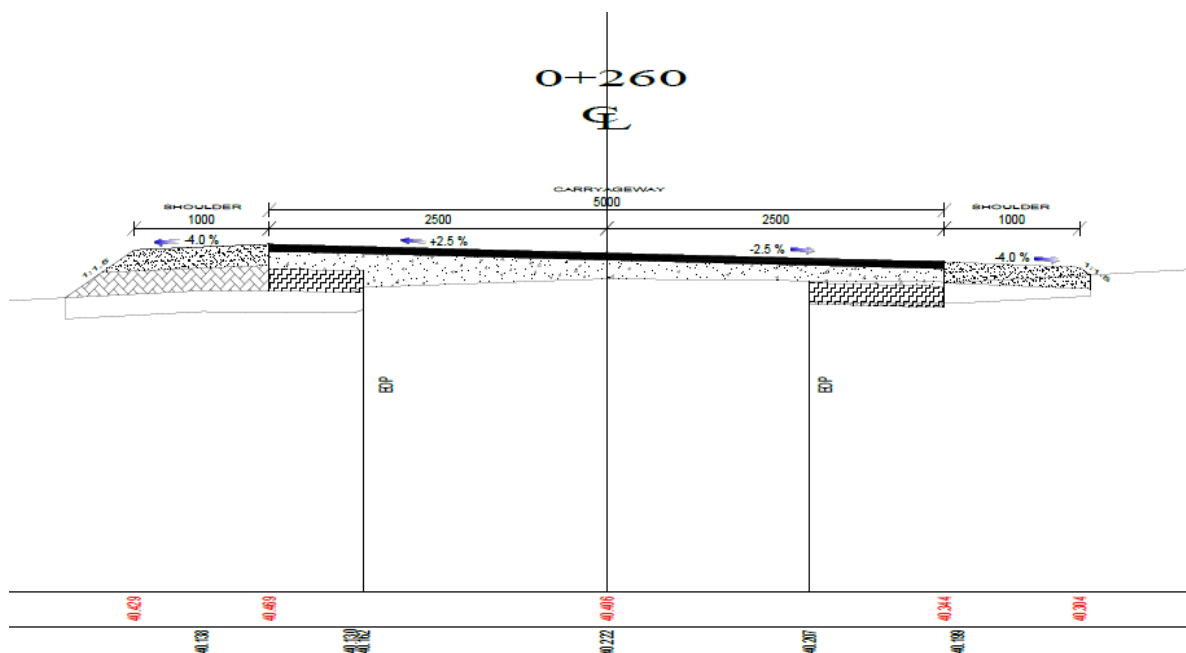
I Road typical cross section (Road NO 64-Polannaruwa)
